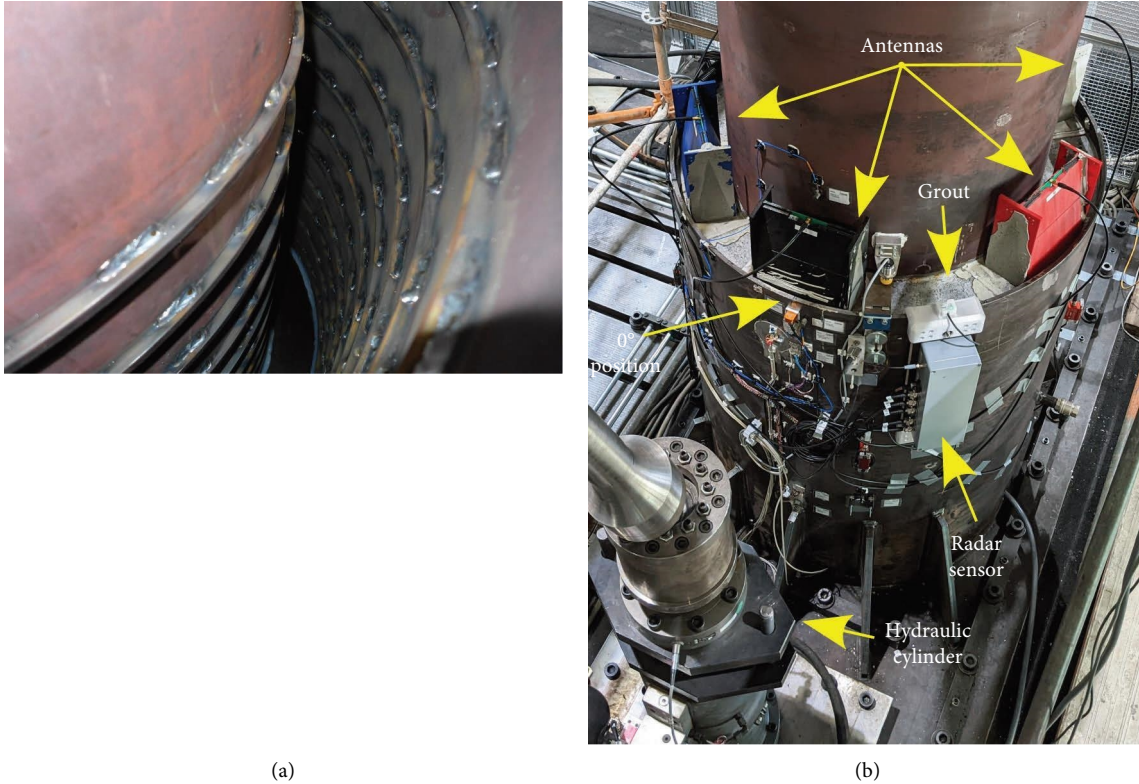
(a) Gap between the metal tubes with shear keys that is subsequently filled with grout; (b) radar sensor mounted on the outer metallic tube together with the antennas directly coupled to the grout from the top. Additionally, a hydraulic cylinder and other sensors are shown.
